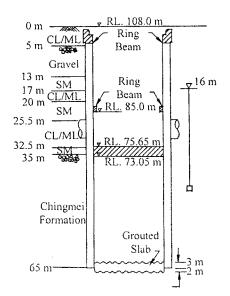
Grout plug at Ventilation Shaft in Contract CH221
